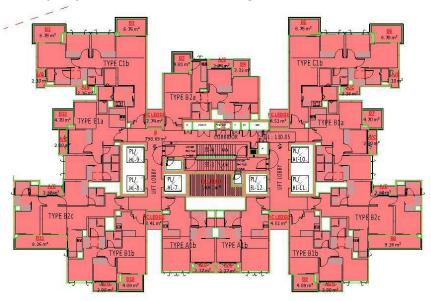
Example of SGFA Plan: General Building (Above Sub level)
